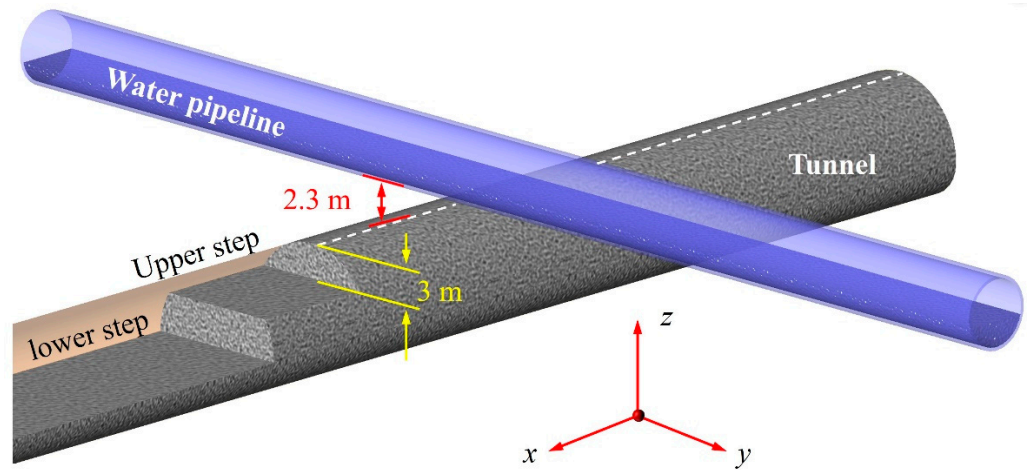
High-speed railway tunnel underneath an existing large water pipeline.
